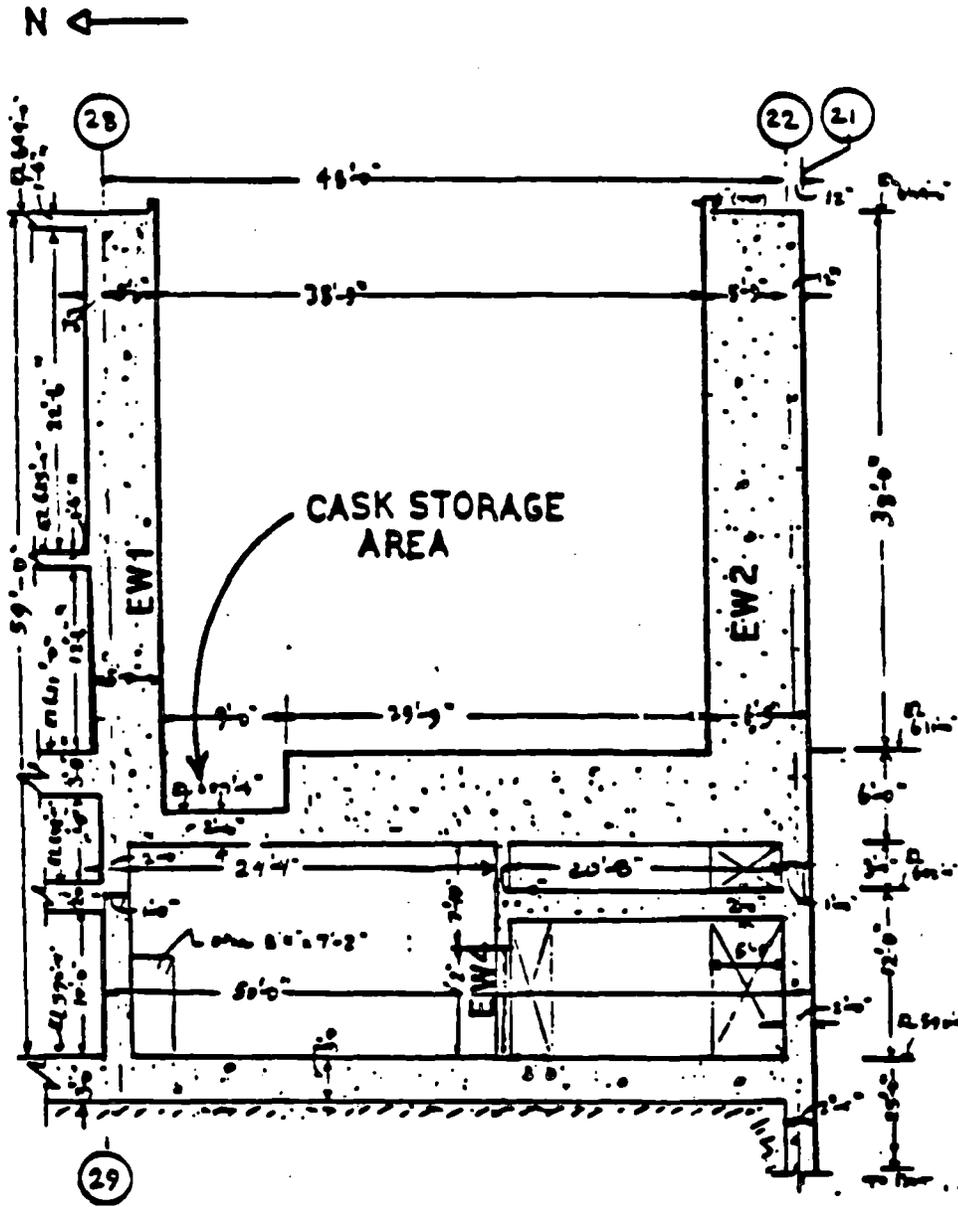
Section B-B - Elevation 590 ft to 649 ft
